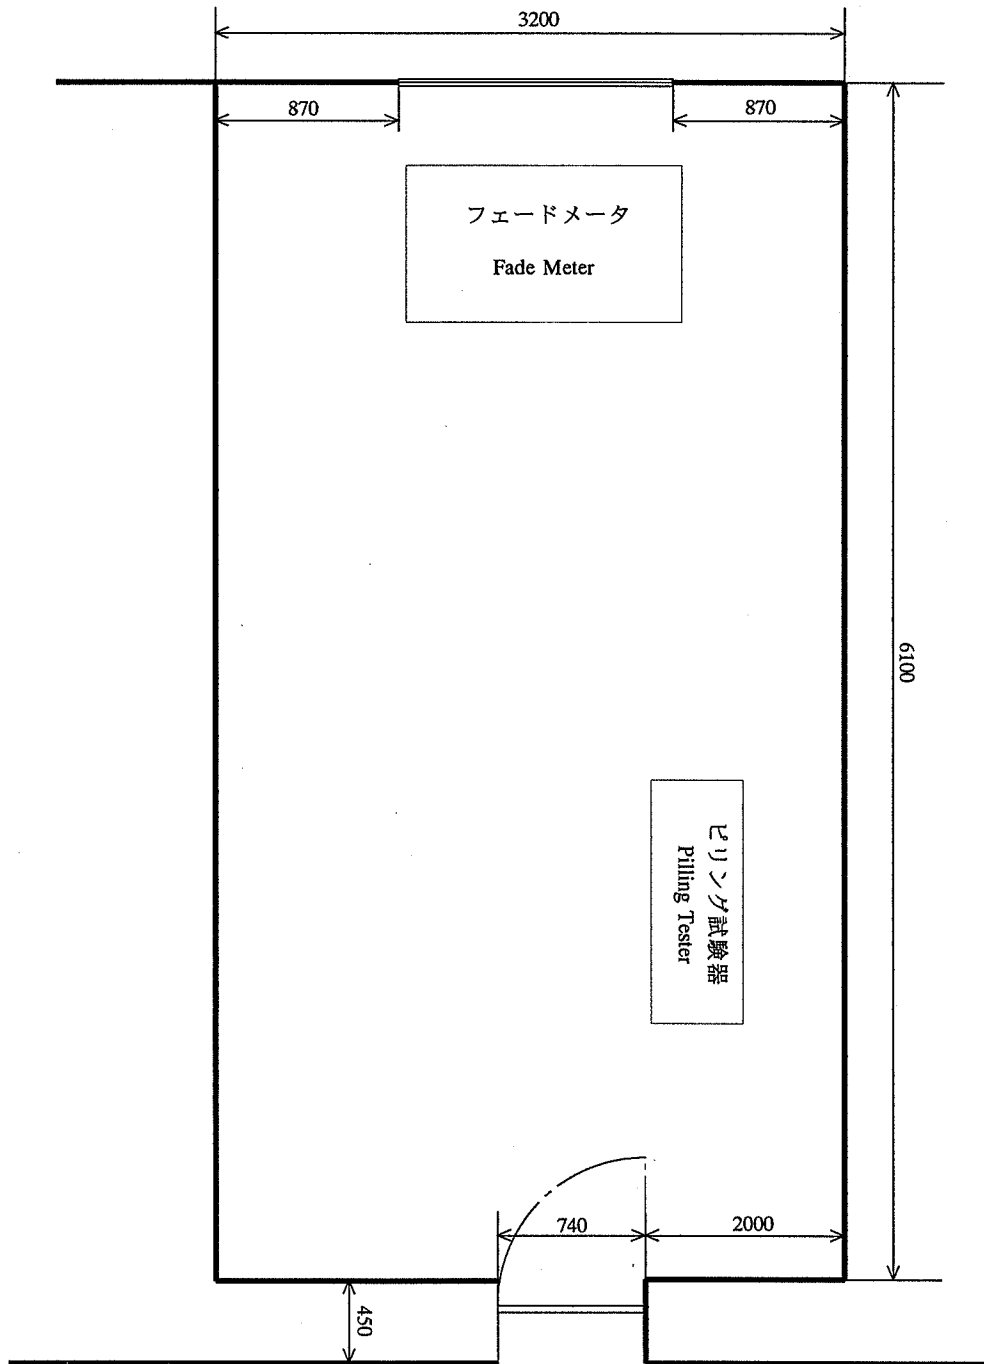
Layout Plan (4)Textile Products testing Laboratory(No. 2)
